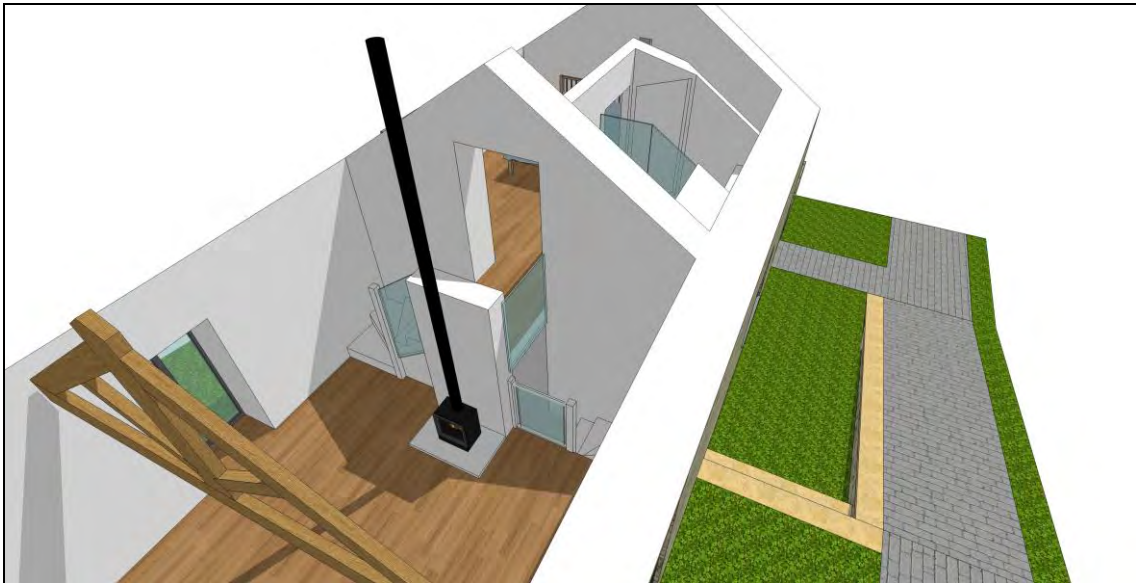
ELEVATED VIEW OF LIVING SPACE & STAIRCASE CONFIGURATION
